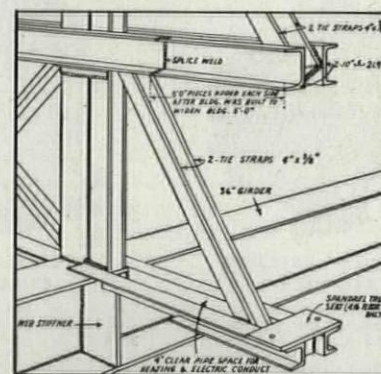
Column and Spandrel Support—Typical detail fourth to eleventh stories. Shows addition of 5'0" to building by splicing 10" channels to the frame. Tie straps are 4" x 3/8" angles.
